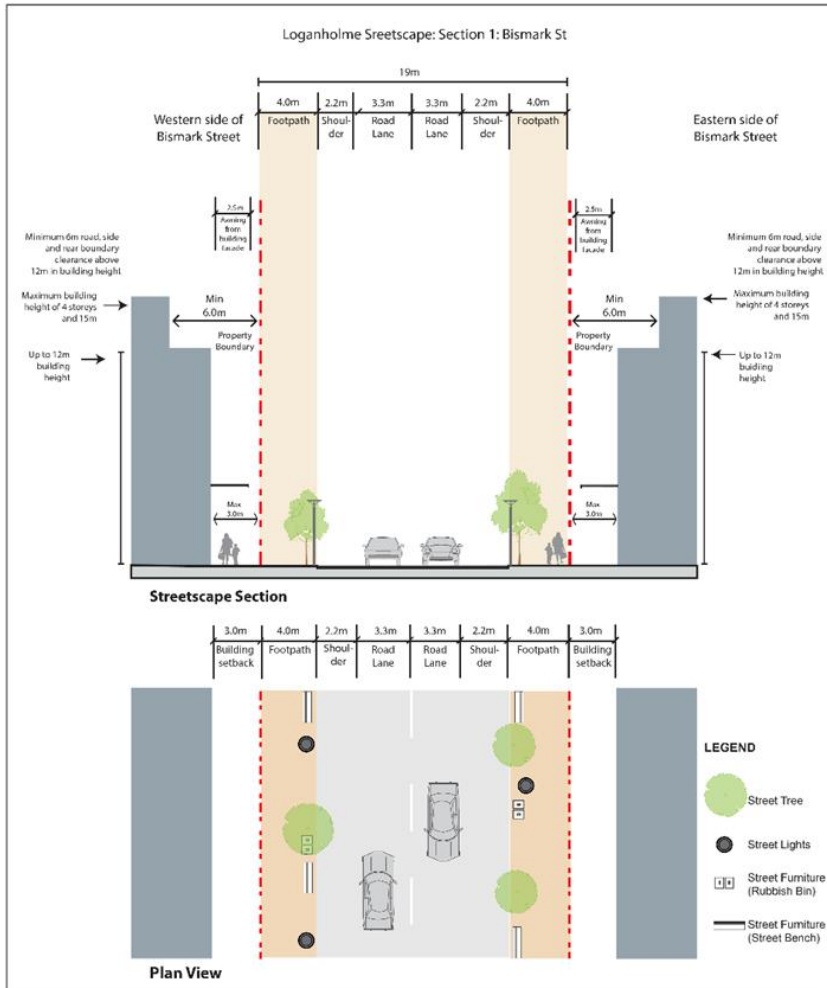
Loganholme streetscape: Bismark Street
